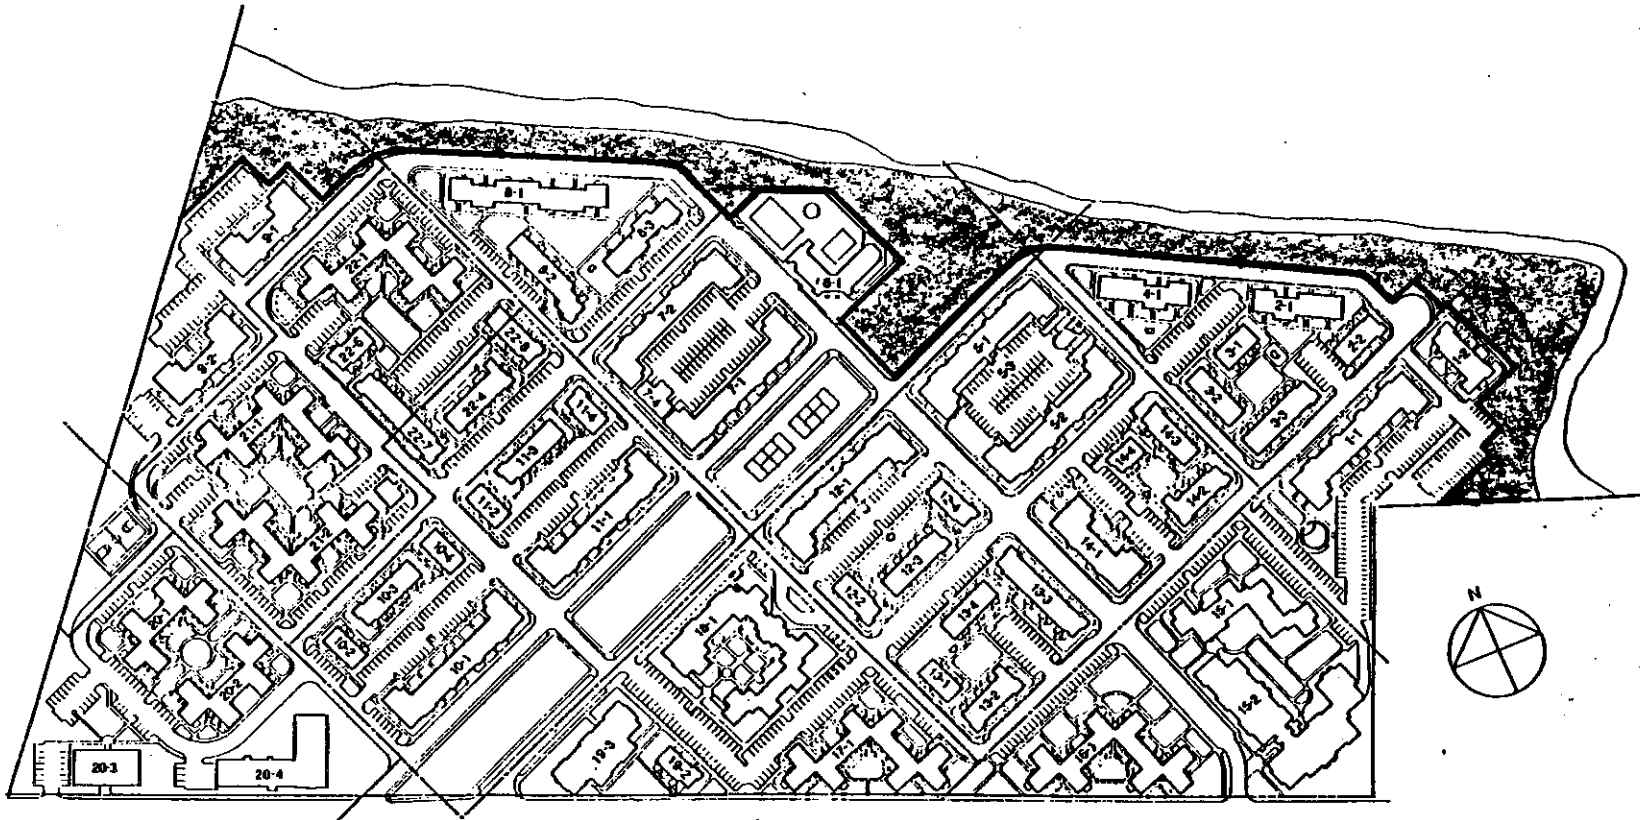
TO PDA PLAN SECOND AMENDMENT
